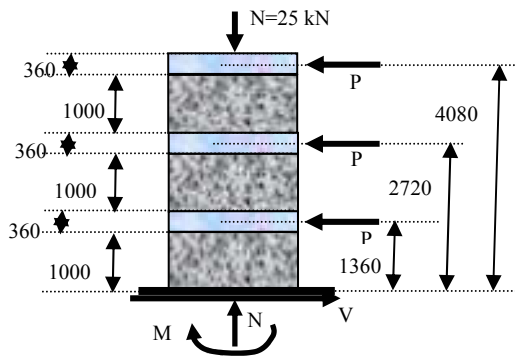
External loading and reactions on RC wall (dimensions in mm).
